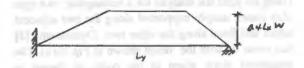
Propped cantilever beam loaded with trapezoidal loading
